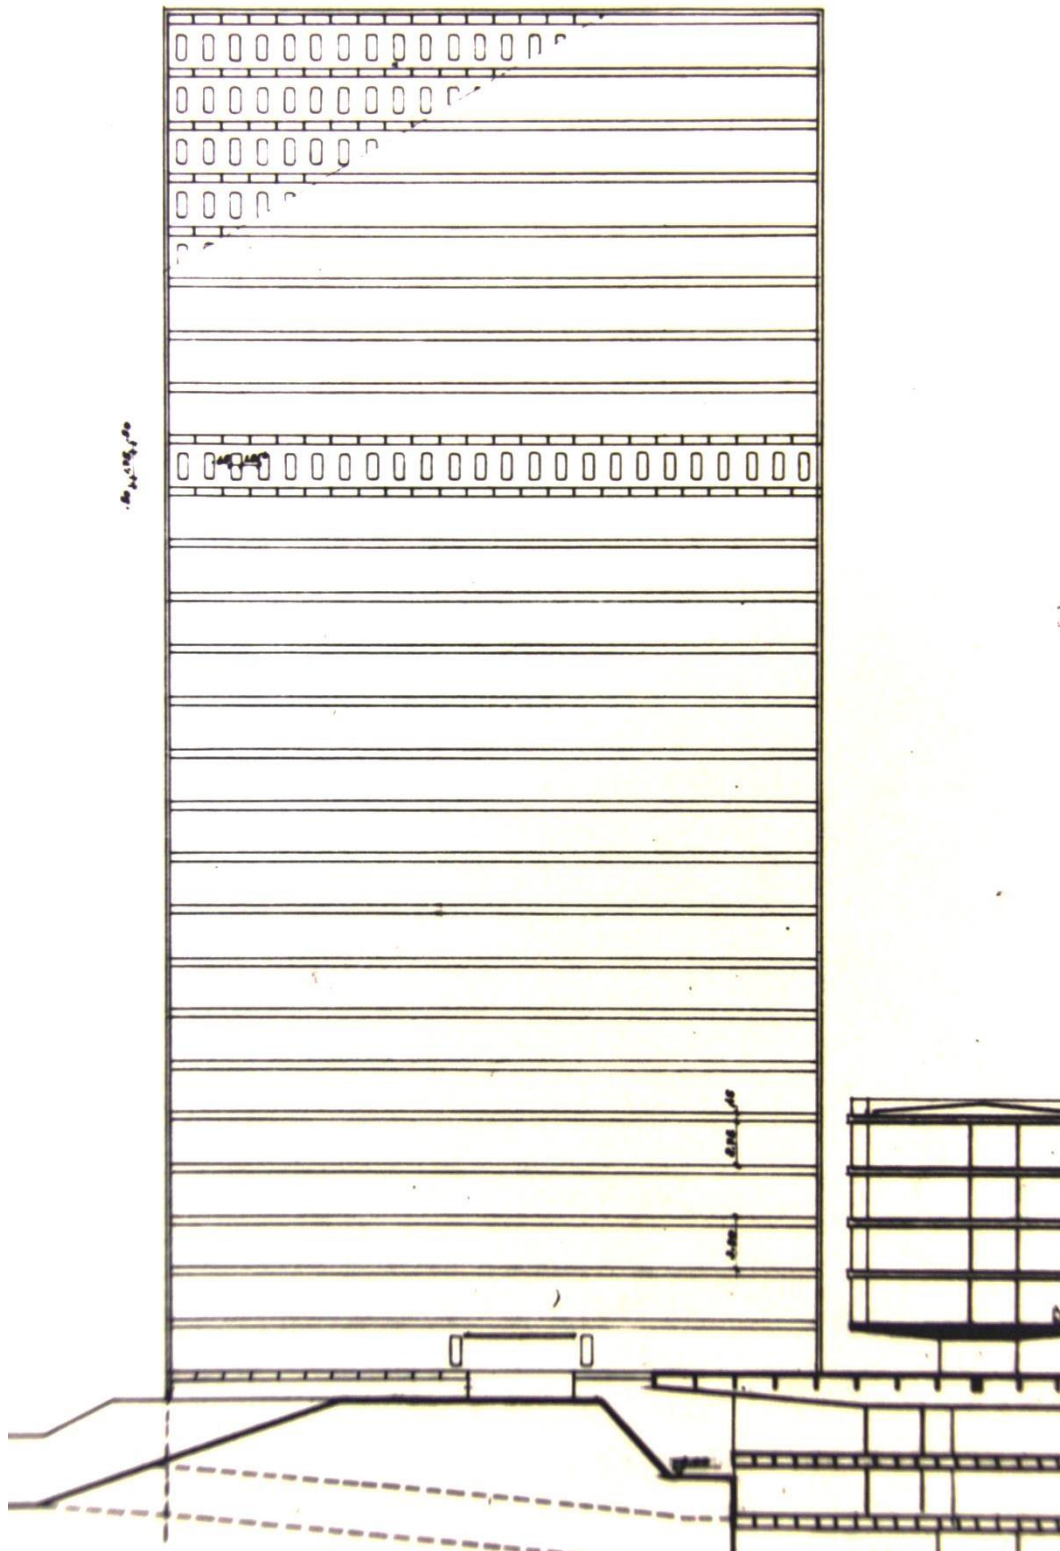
The 1966 booklet, a detail view of the elevation of the tower's south-eastern facade (Anonymous 1966)
